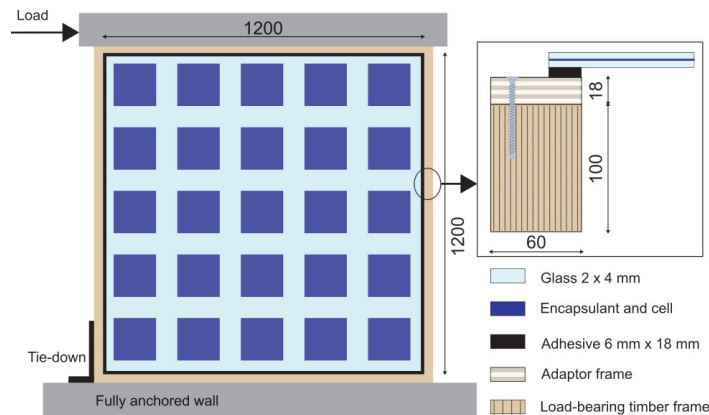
Timber-glass shear wall with a detailed cross-section (dimensions in mm)
